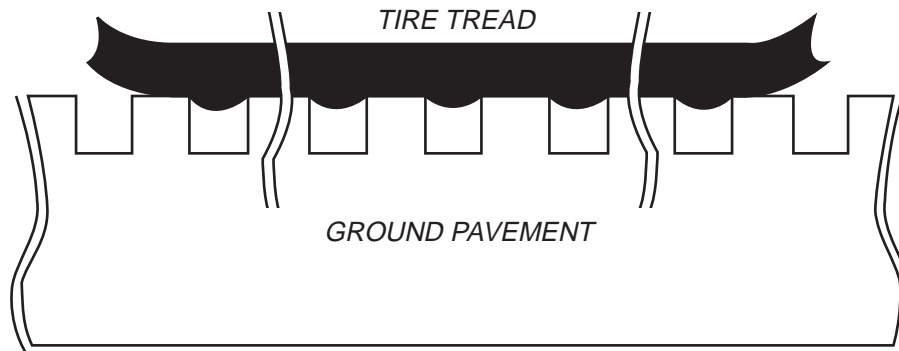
Mechanical interlock between tread rubber and grooves in a diamond-ground pavement.
